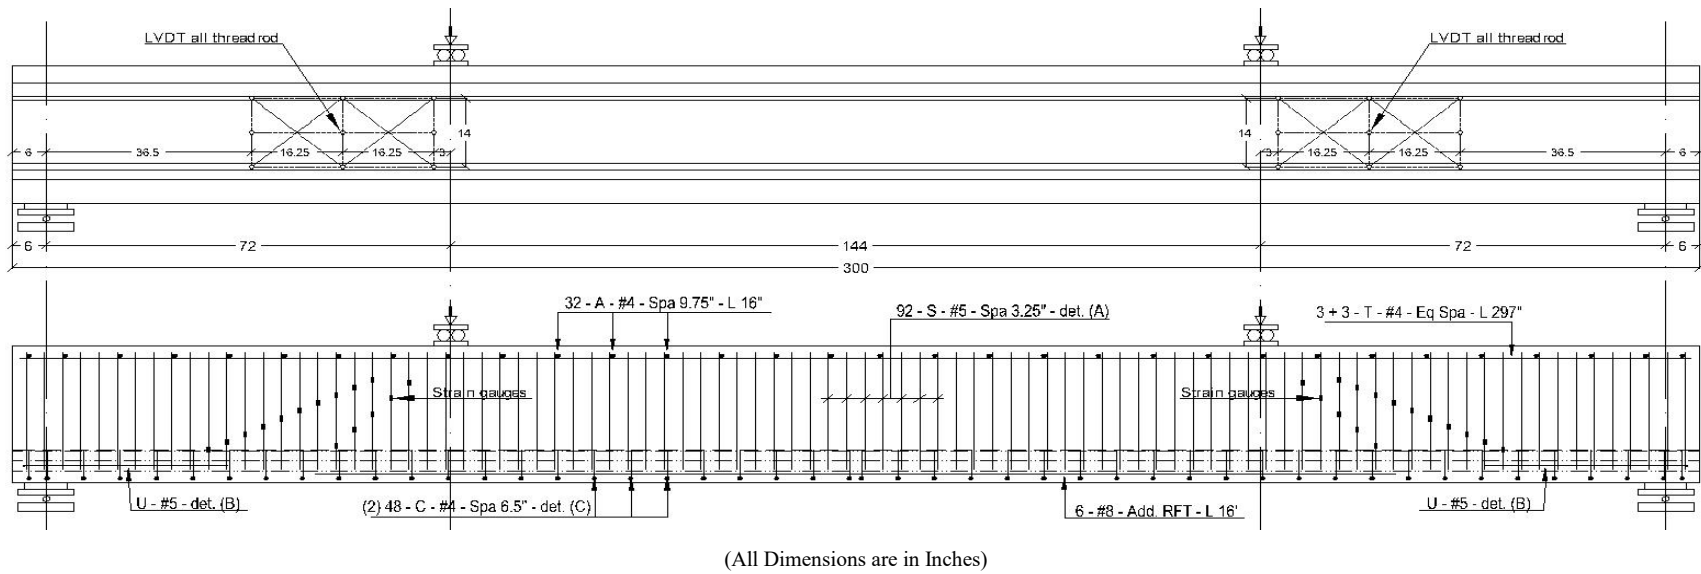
Detailed Longitudinal Cross-Section for Girder C2
